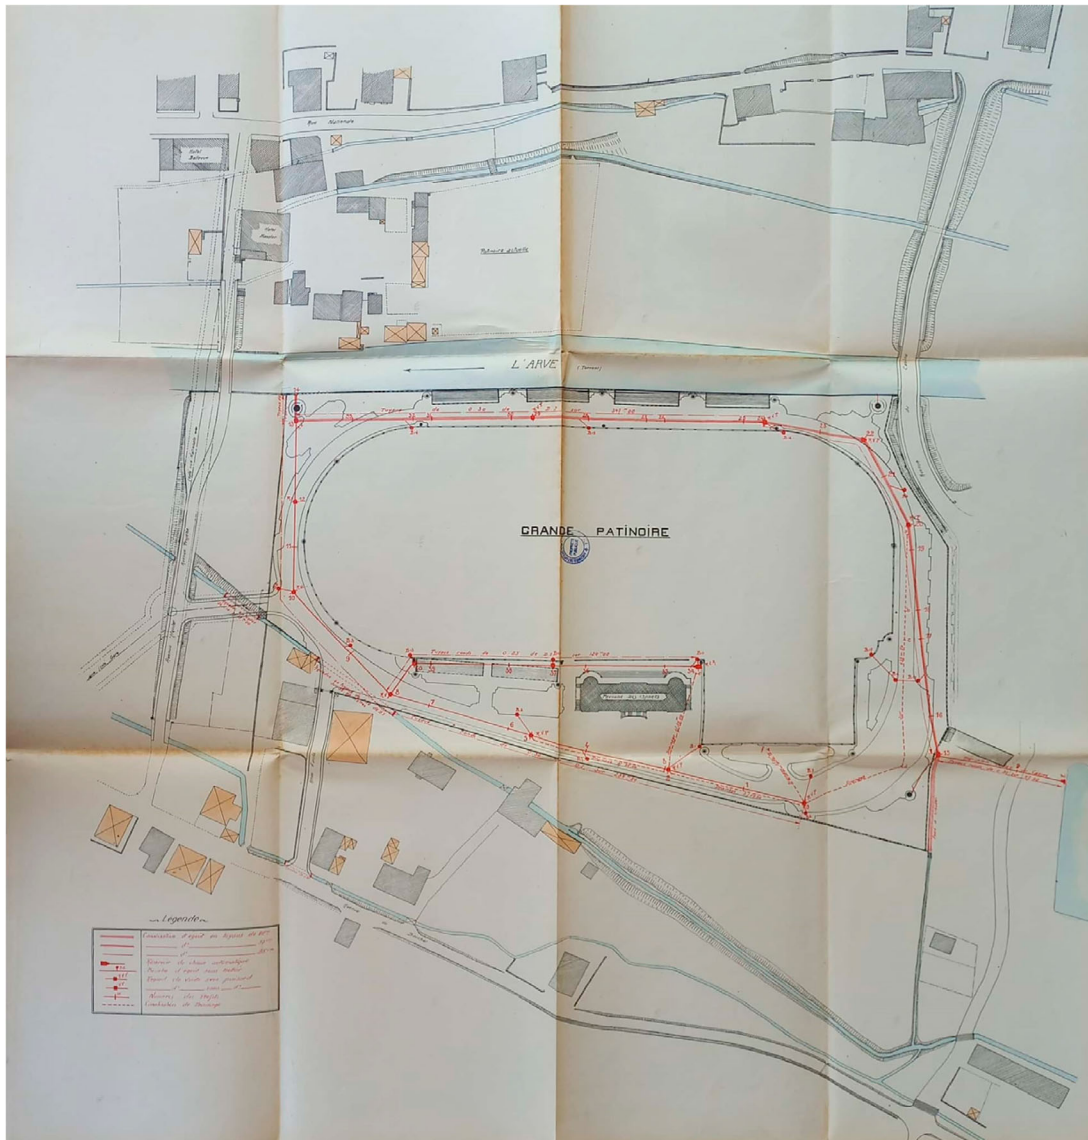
Ice rink. Sewers and drainage. General plan of sewers. 06/04/1923, 20 2181, Arch. dép. Haute-Savoie.
